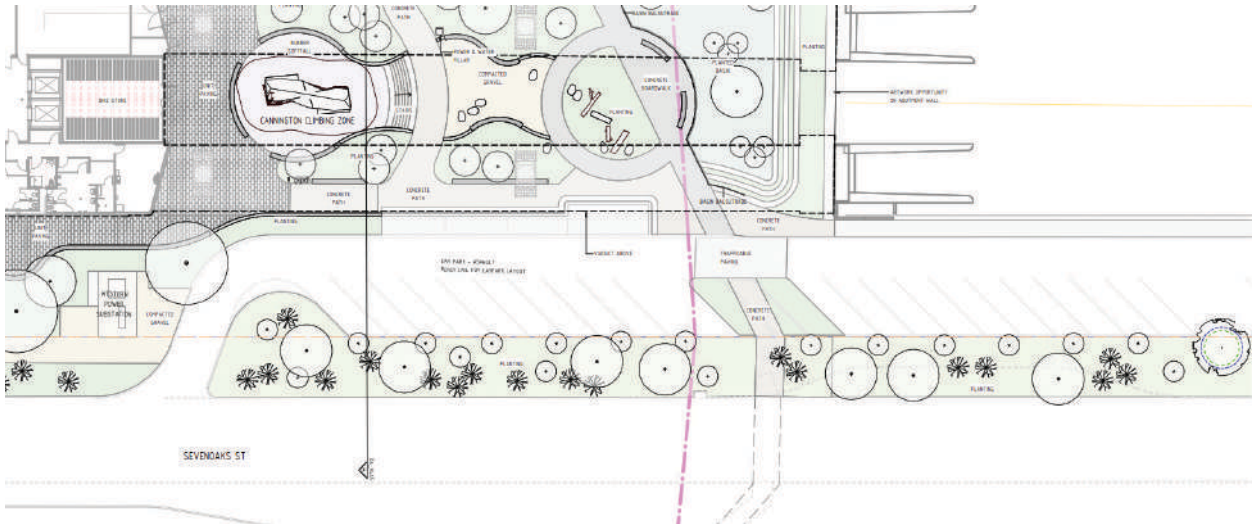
Proposed new Cannington Kiss 'n' Ride Parking Facilities
